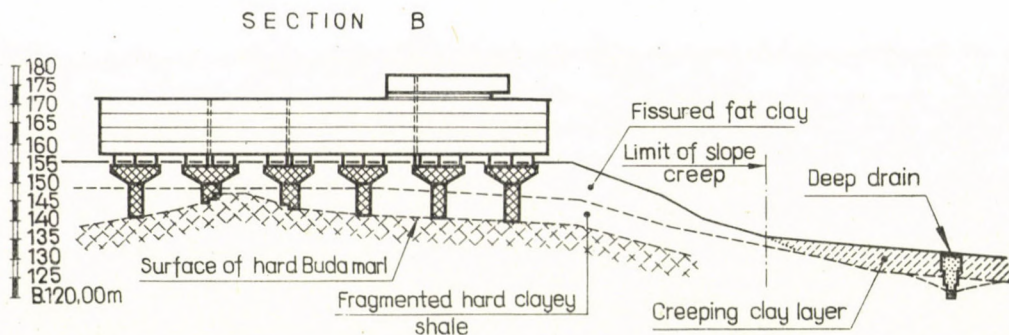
N-S profile with section through the Hotel building and foundations of different depths
